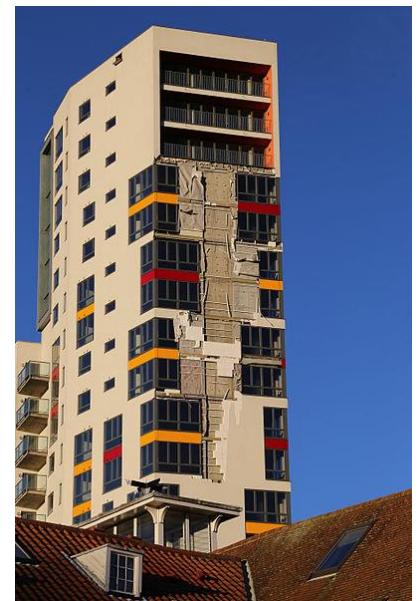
Damage to cladding of a building in Ipswich - By Steven James Fosdick on Wikimedia
